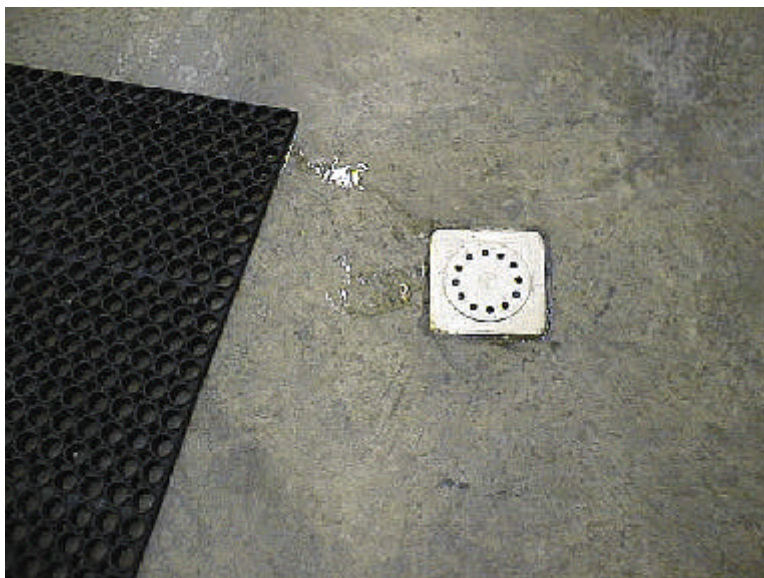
Floor Drains leading to FPWDWs at a Shellfish Processing Facility
